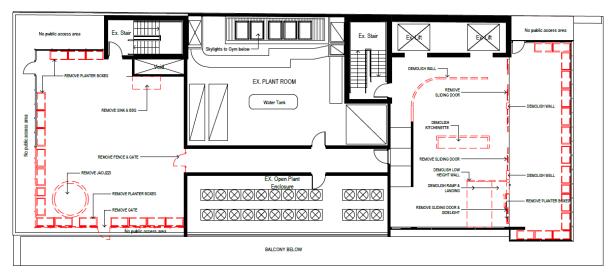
Proposed partial demolition on the rooftop. From Drawing TP05
